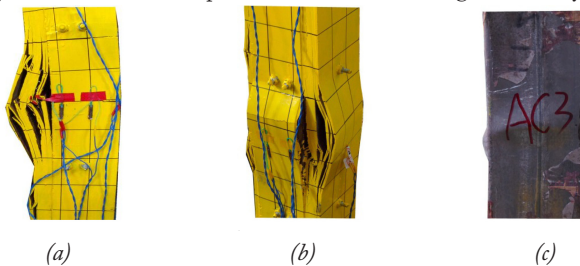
Specimen failure modes: (a) bamboo plywood failure on one side of the specimen, (b) barrel-shaped bamboo plywood failure, and (c) buckling of the steel tube.
